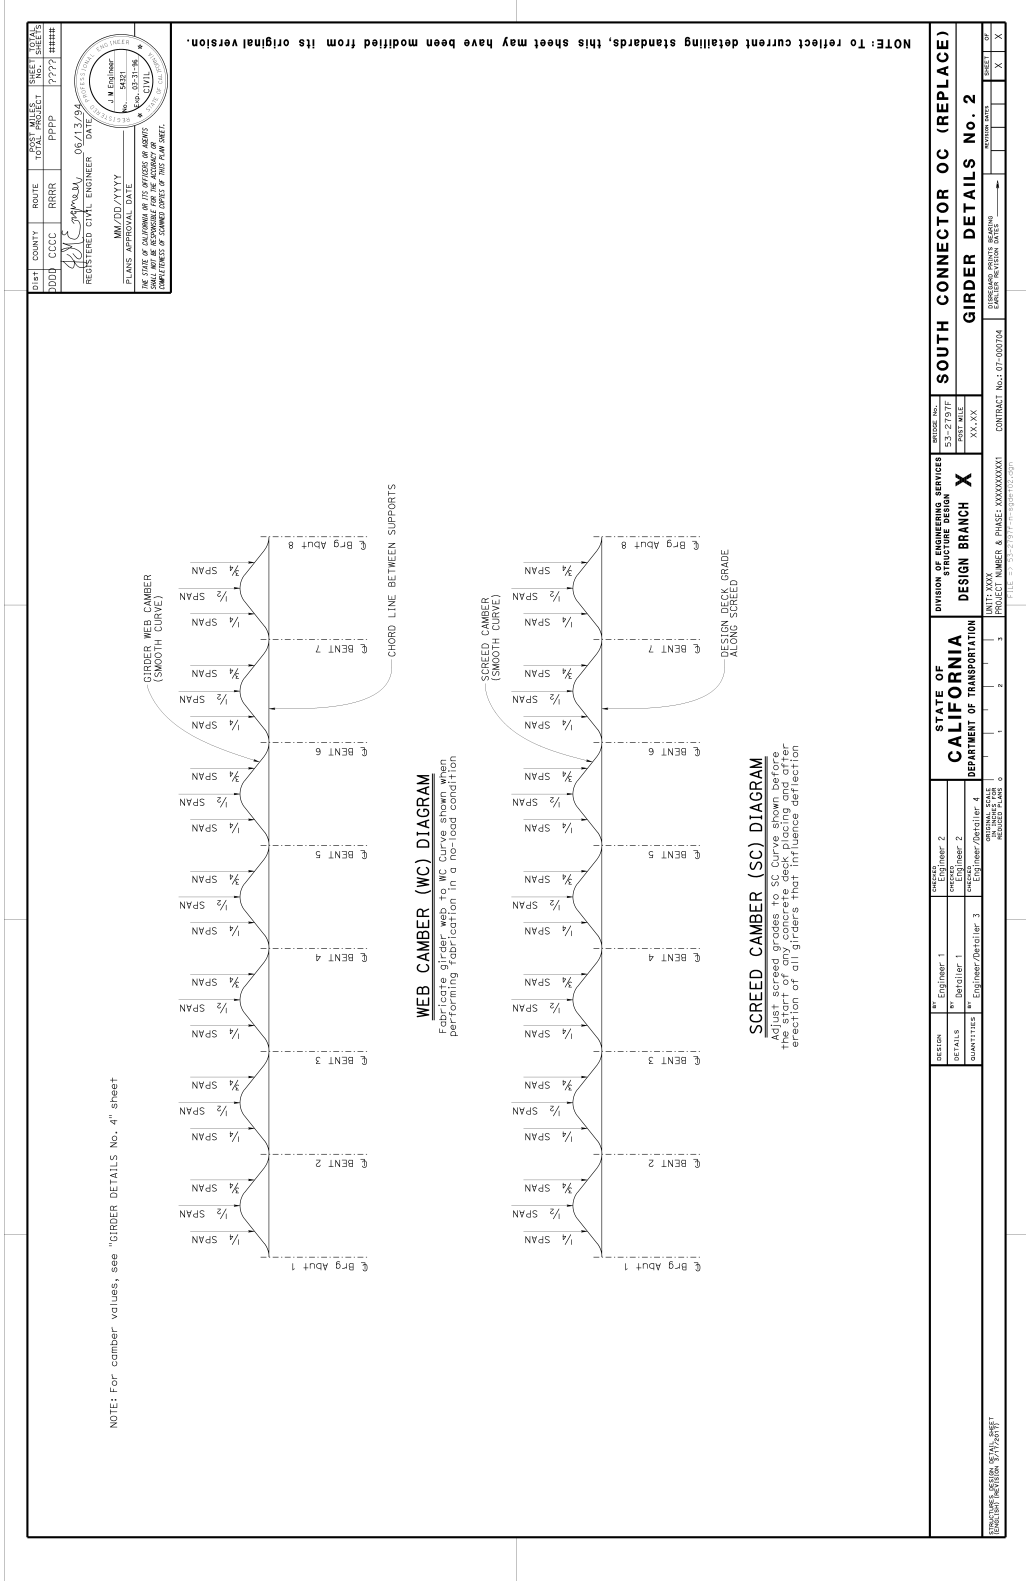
A.A.8 Steel Girder Bridge Detailing Example 8
